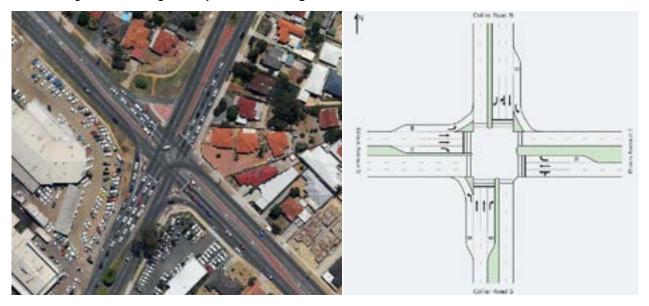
Broun Avenue/Collier Road – Existing Geometry
